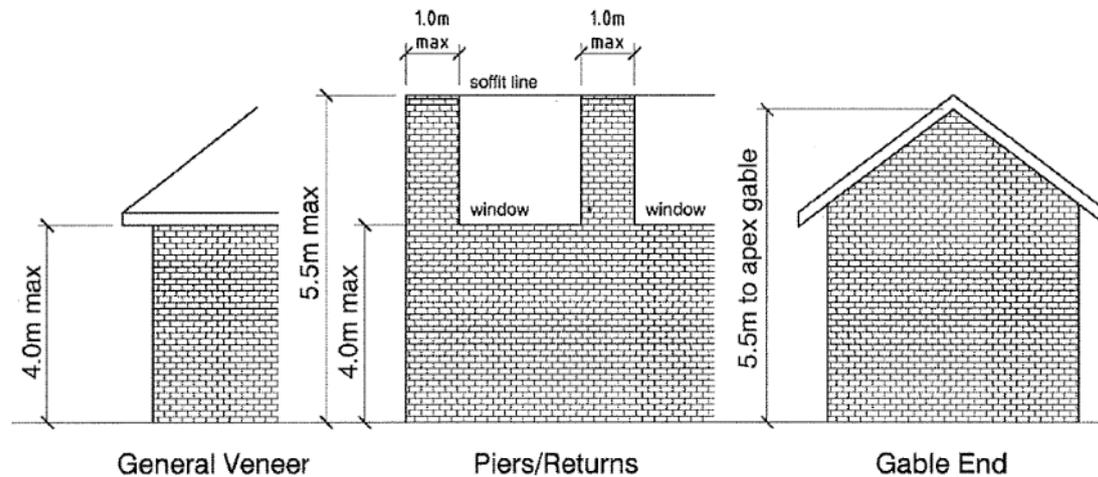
Maximum veneer heights for single storey, running-bonded construction
